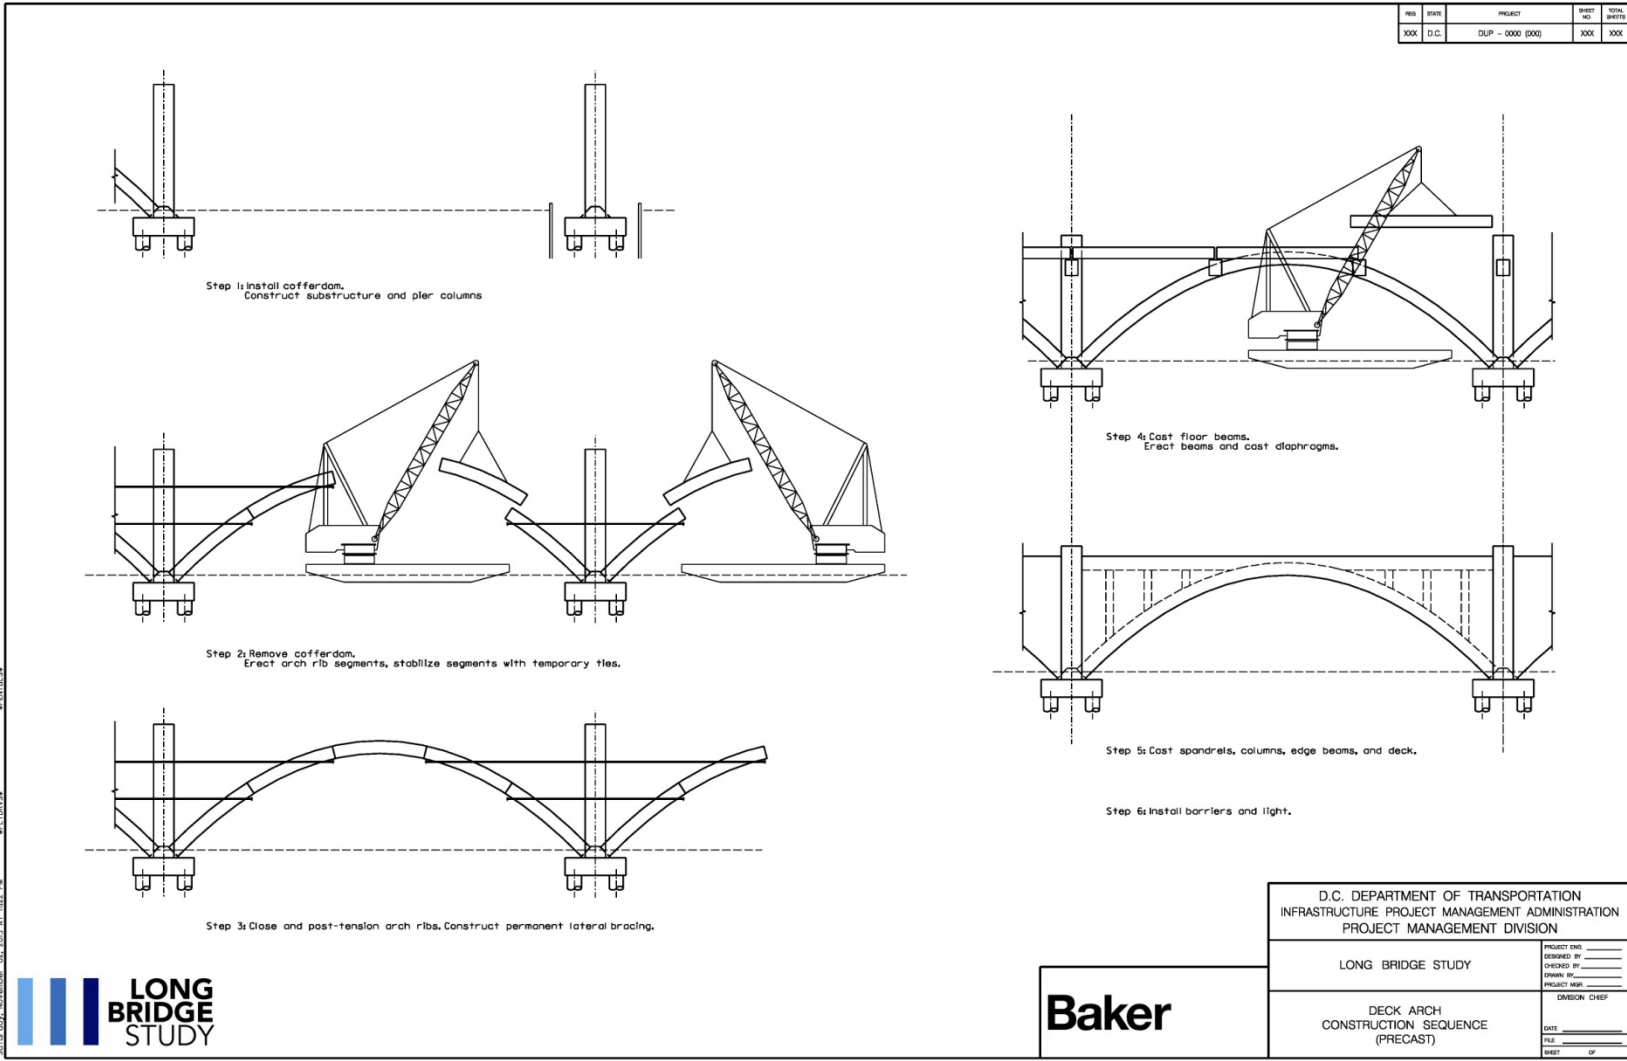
Concrete Deck Arch Construction Sequence – Precast
